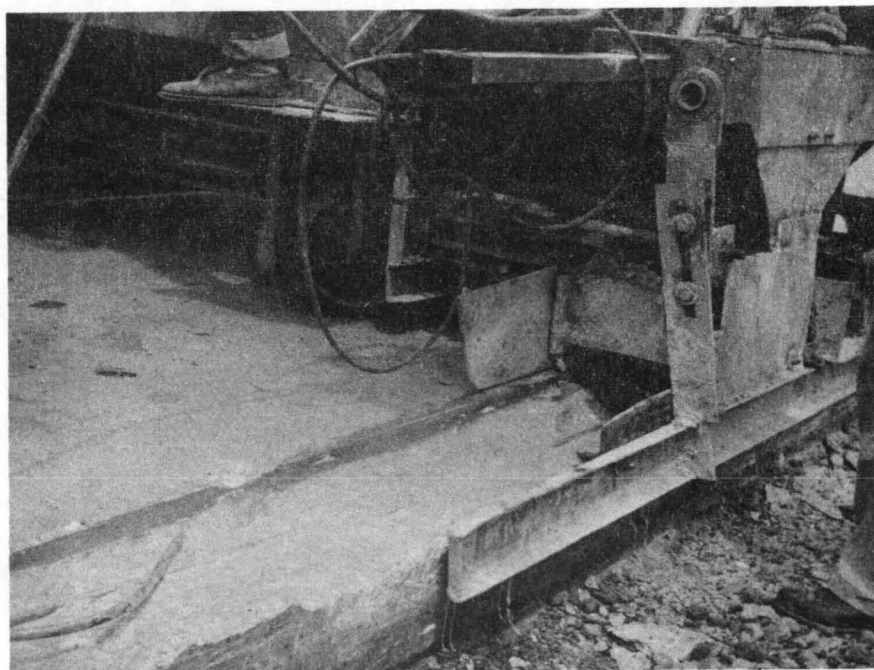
Hallet Construction Company's paver which was modified to place curb filler material.
